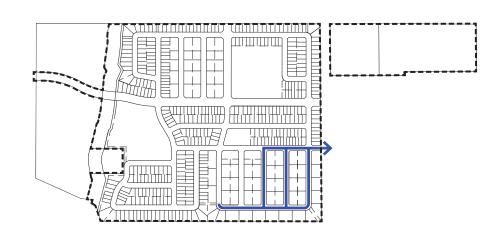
Local Road (Typical 16.5m ROW - Area 1)
